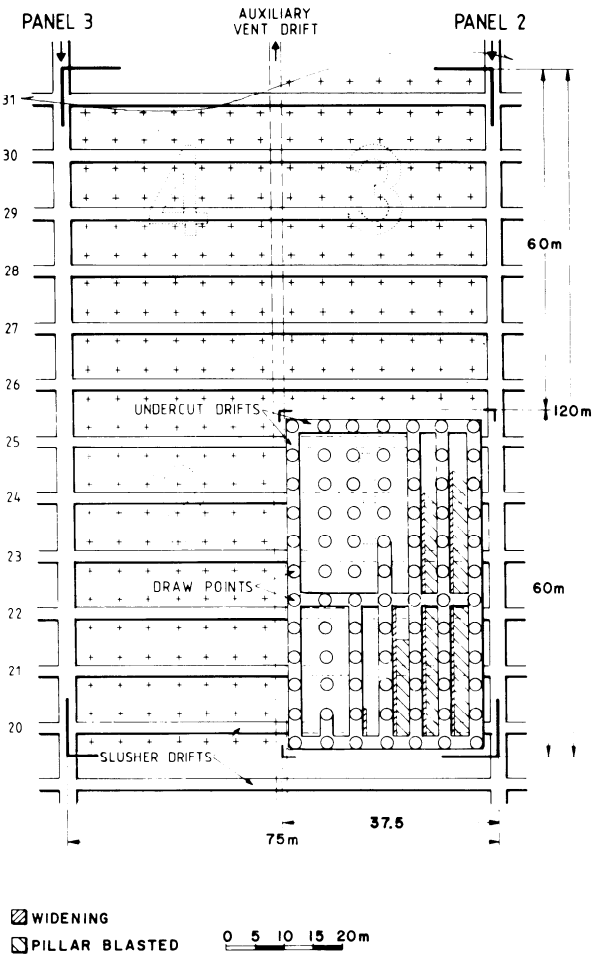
Proposed stope plan at undercut level. Conversion factor: 1 ft = 0.3048 m.
